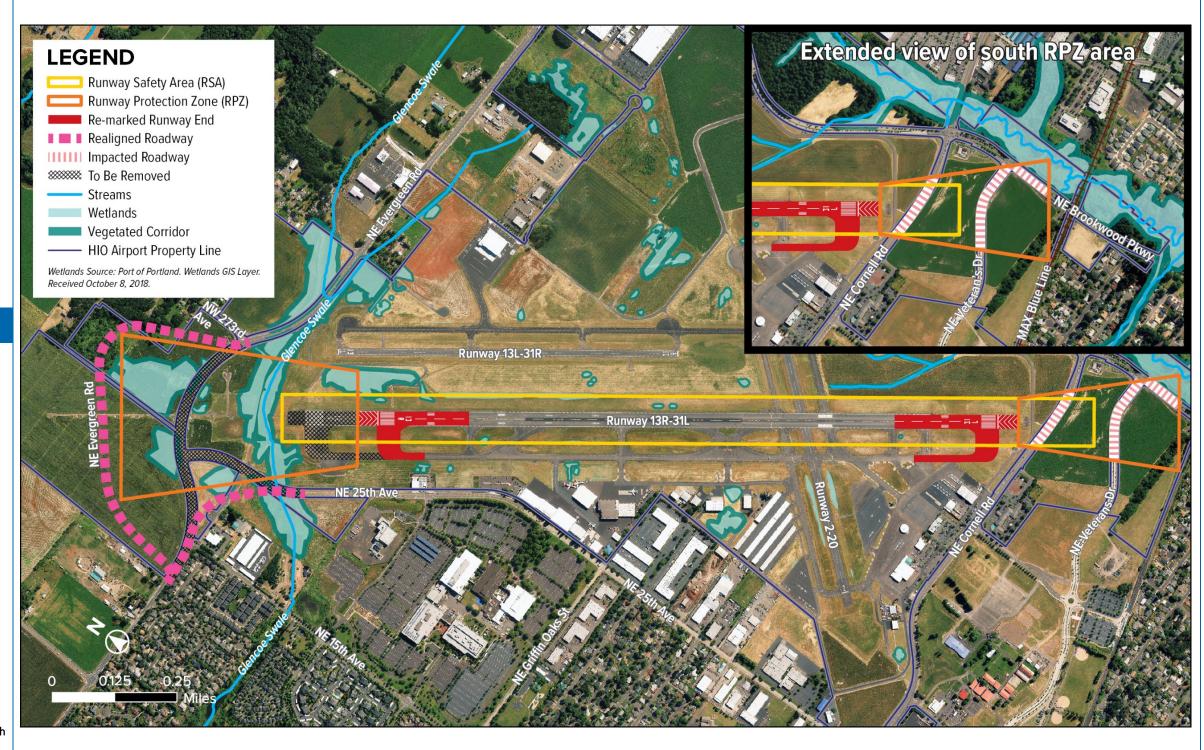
Alternative 4: Install Engineered Material Arresting System (EMAS)
